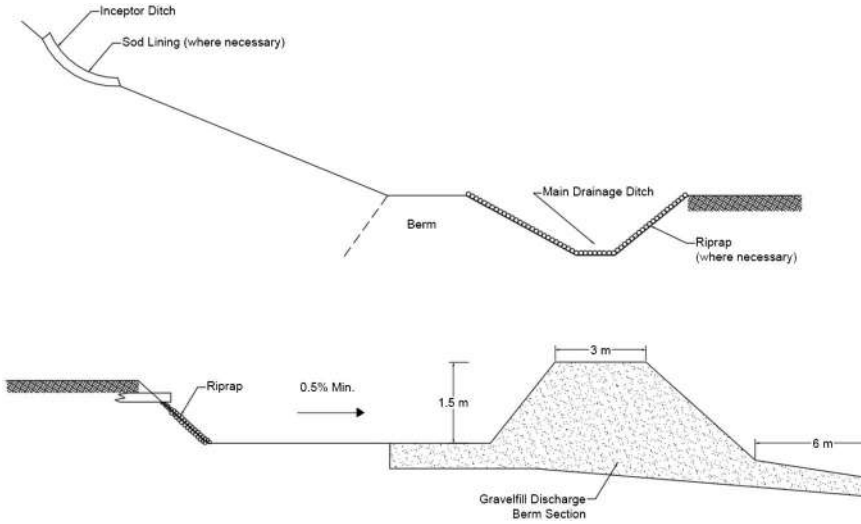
Example cross sections of a storm water ditch and a basin used in landfill designs
